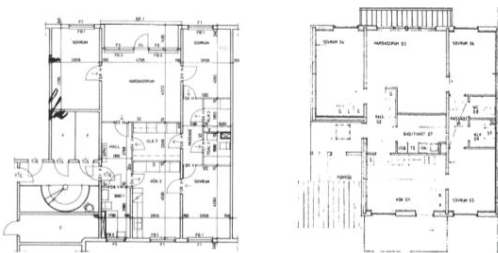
Floor plans showing the layout of a three-bedroom apartment in Norra Bergsjön (left) and Backatorp (right).
